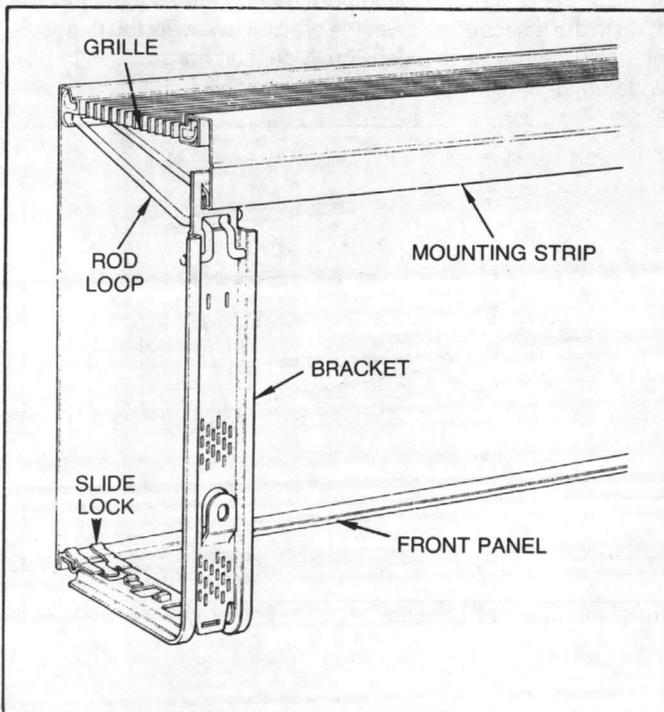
Type TA Enclosure Mounting Detail (View from Rear)
